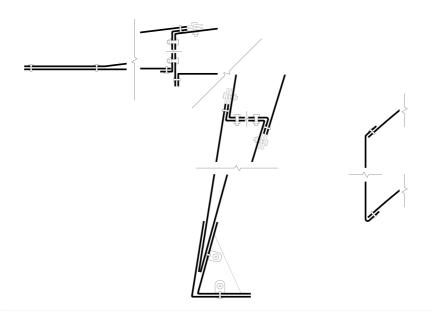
Longitudinal section and plan detail of bay A with permanent rivets and removable bolts.
